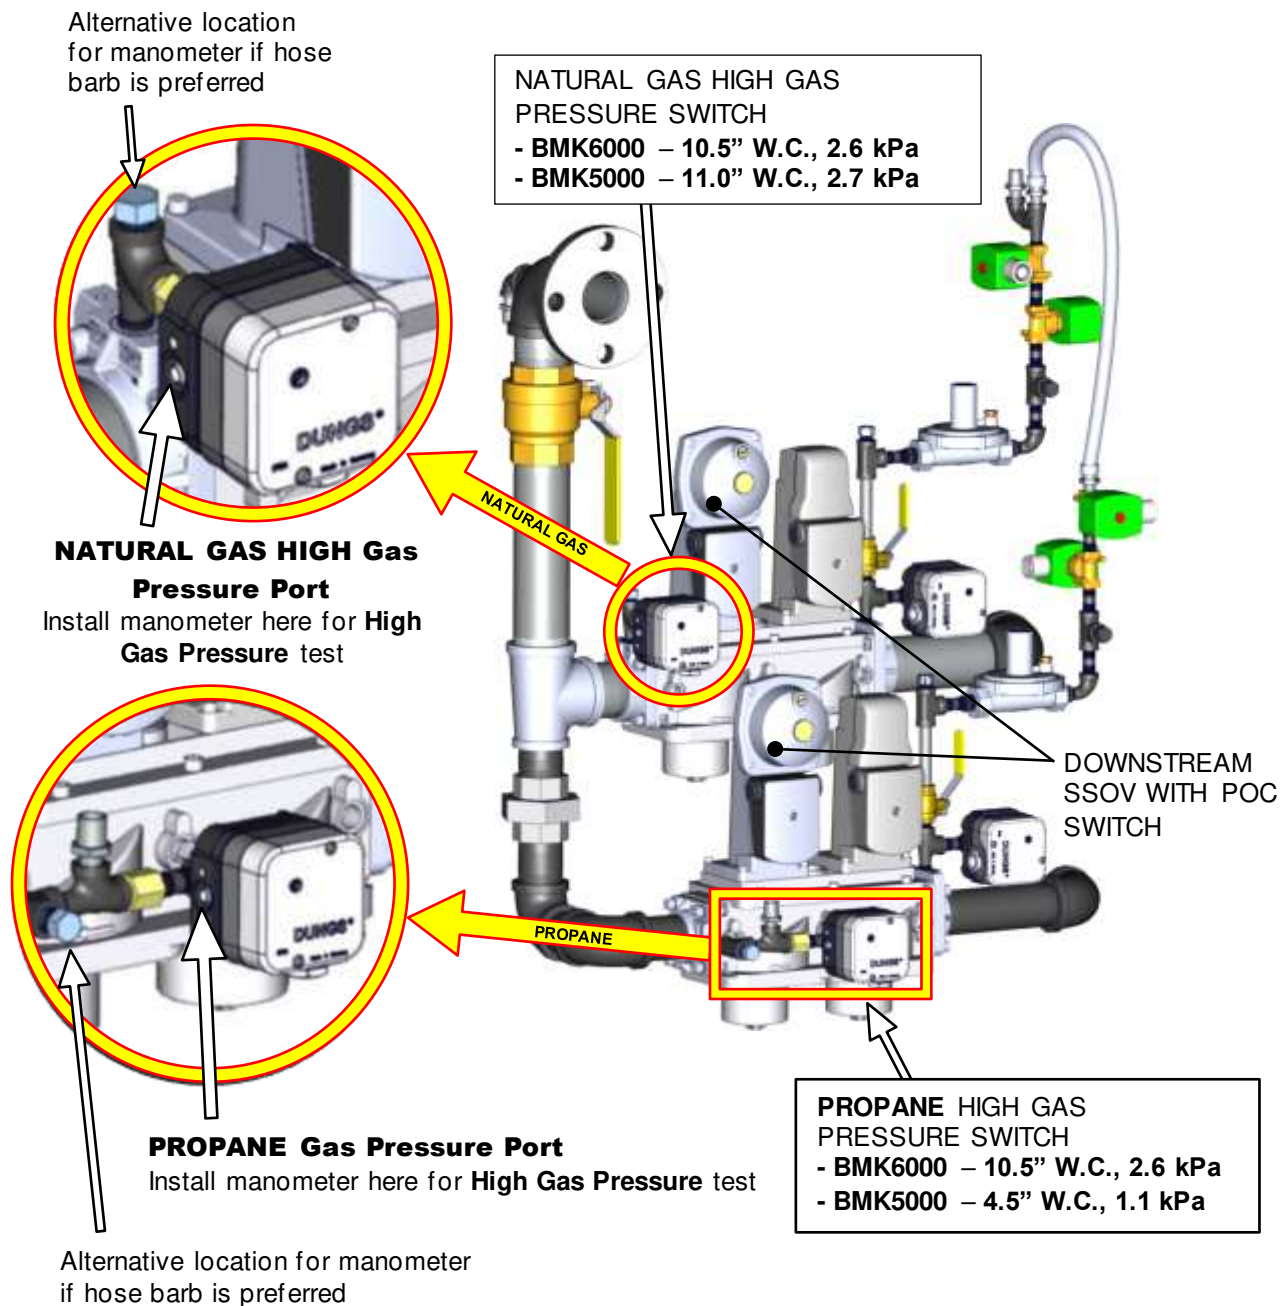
BMK5000/6000 High Gas Pressure Test Components
